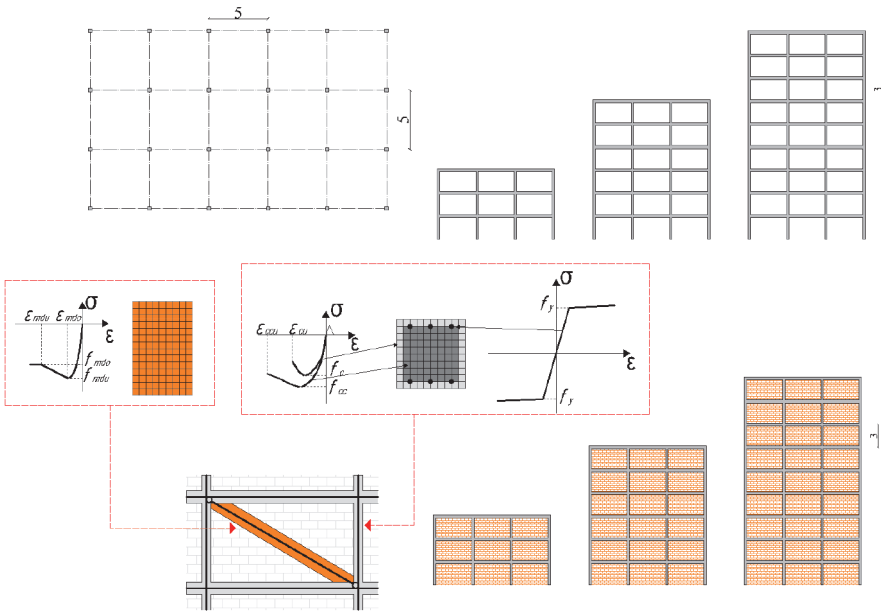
Bare and infilled RC frames and adopted constitutive laws for unconfined – confined concrete, steel rebars and masonry infills
